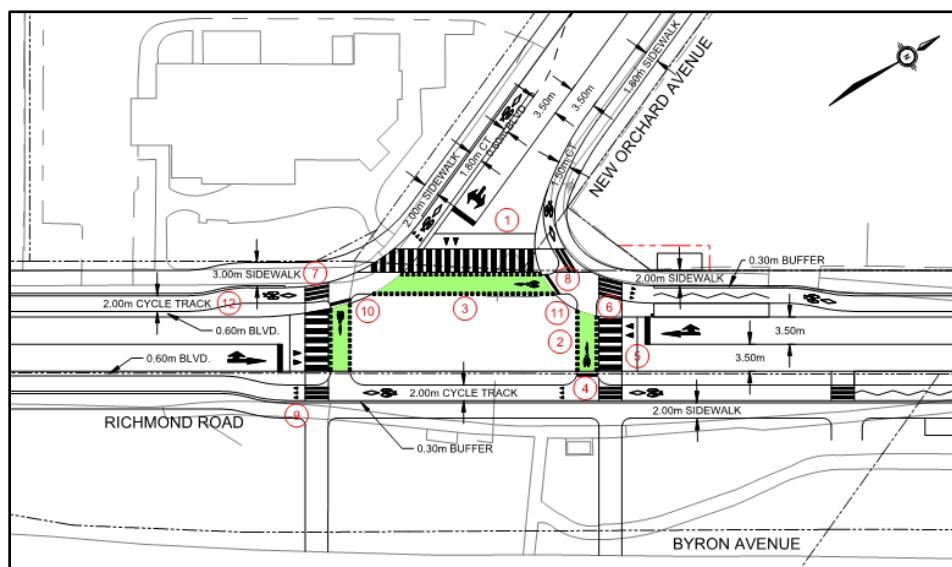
Richmond Road Complete Streets - New Orchard Avenue Intersection
